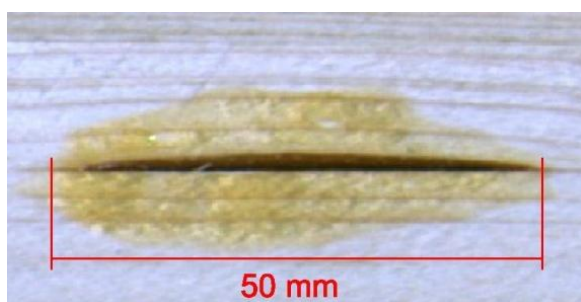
Resin pocket on solid wood panel (sawn lamella). Bottom side of panel showing lake of leaked resin.
